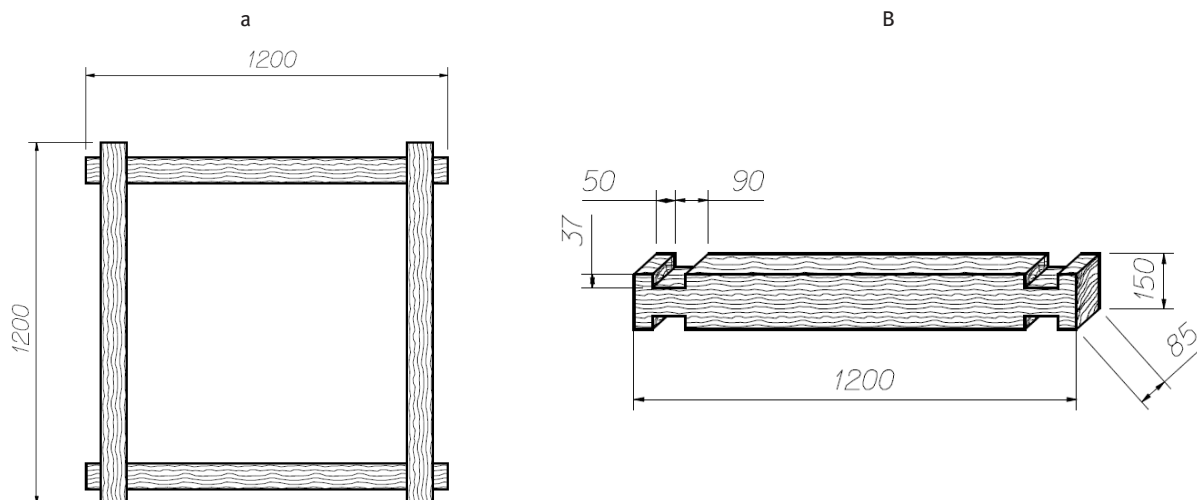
Sketch of the LINK-N-LOCK box crib: a) top view, b) dimensions of a single crib.
